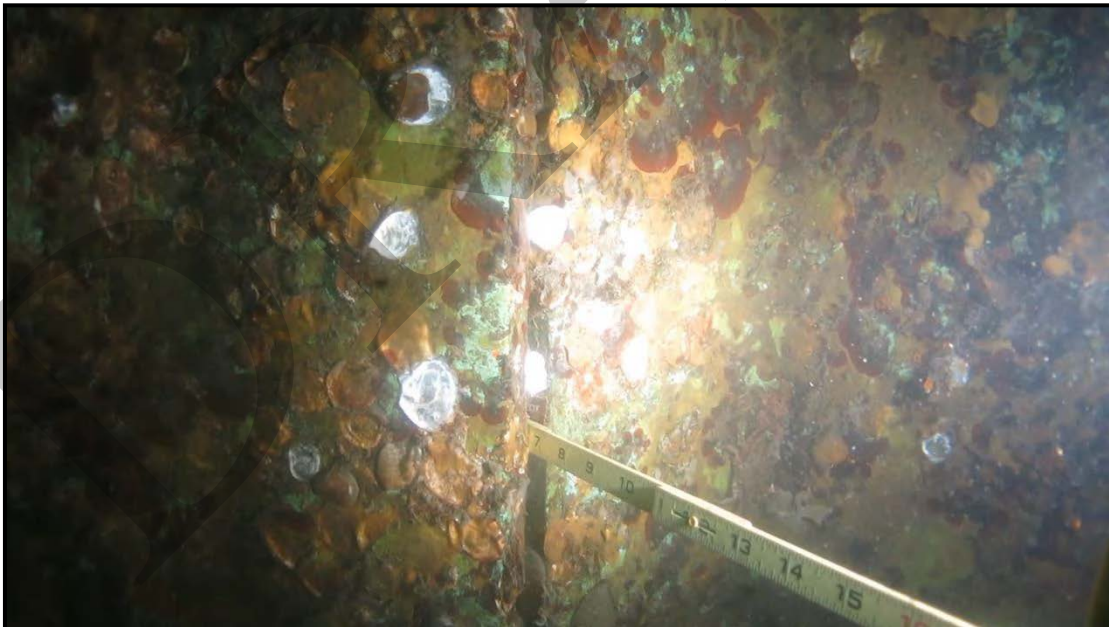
Gap between inner flanges of steel king piles at Corner 6+75 at the west end of Pier 1.
